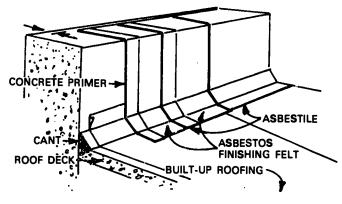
Installation of flashing on a nonnailable masonry wall
